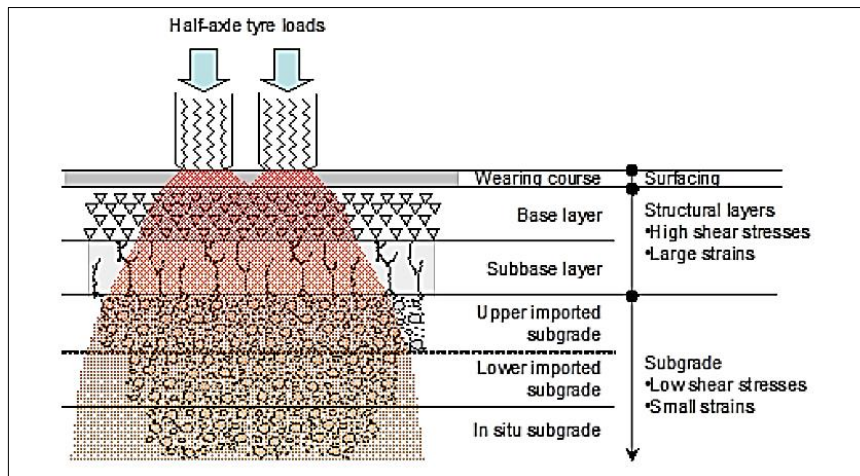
Stress distribution in a typical South African flexible pavement (SAPEM, 2013d)
